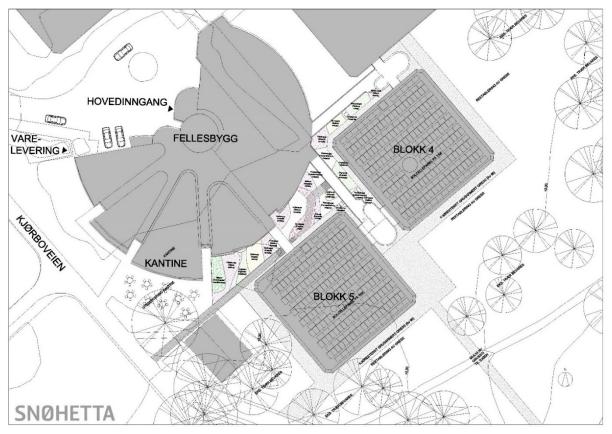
Sketch of the renovated Powerhouse office blocks 4 and 5. Illustration: Snøhetta.
